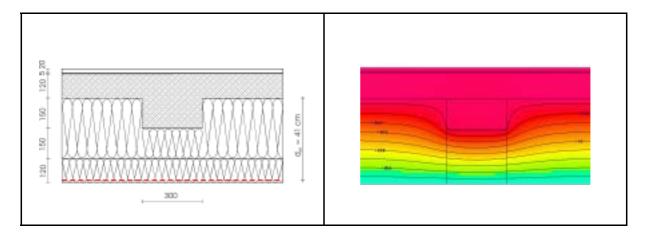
Concrete bearer in the insulation of the floor slab (Final house)
